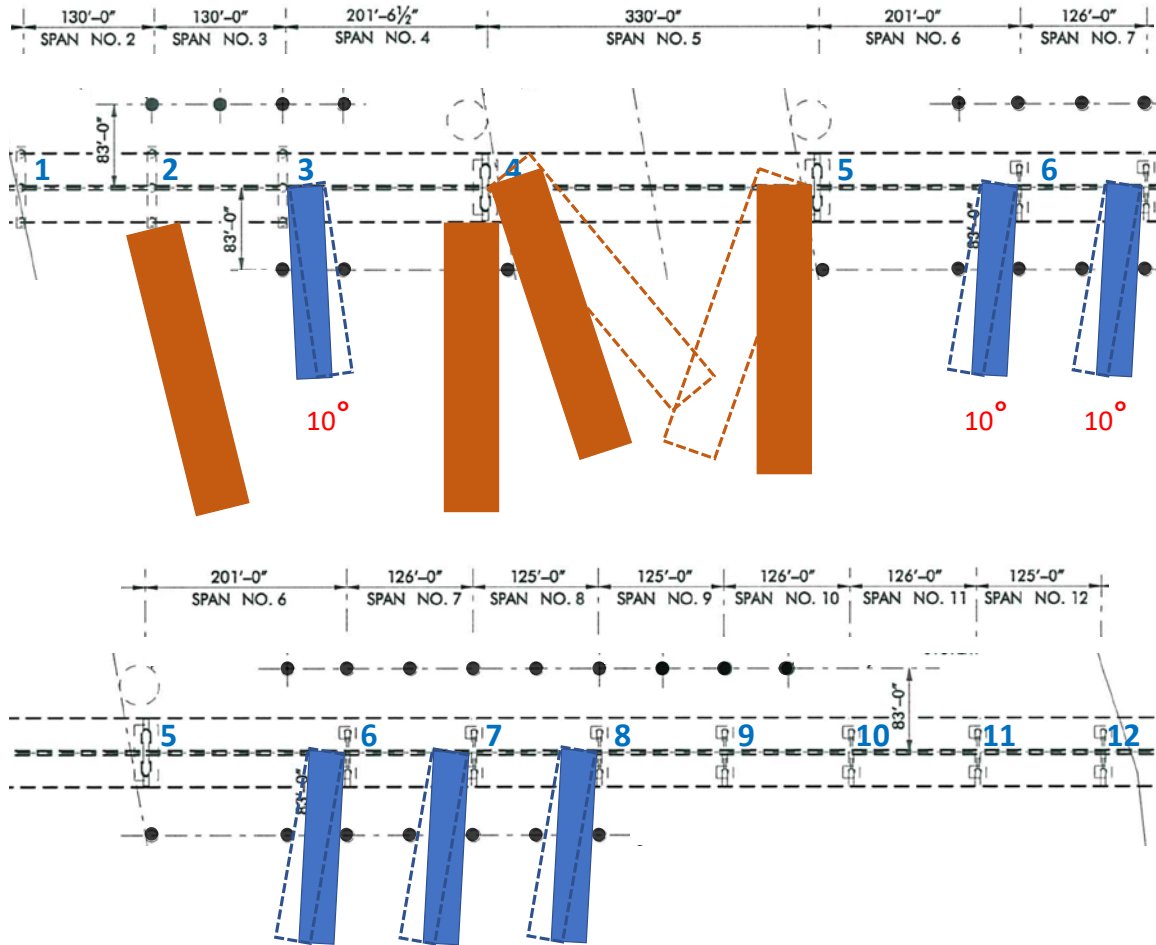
Accessibility of Hopper and Tanker Barges to the Existing Piers for Upstream Traffic Direction
